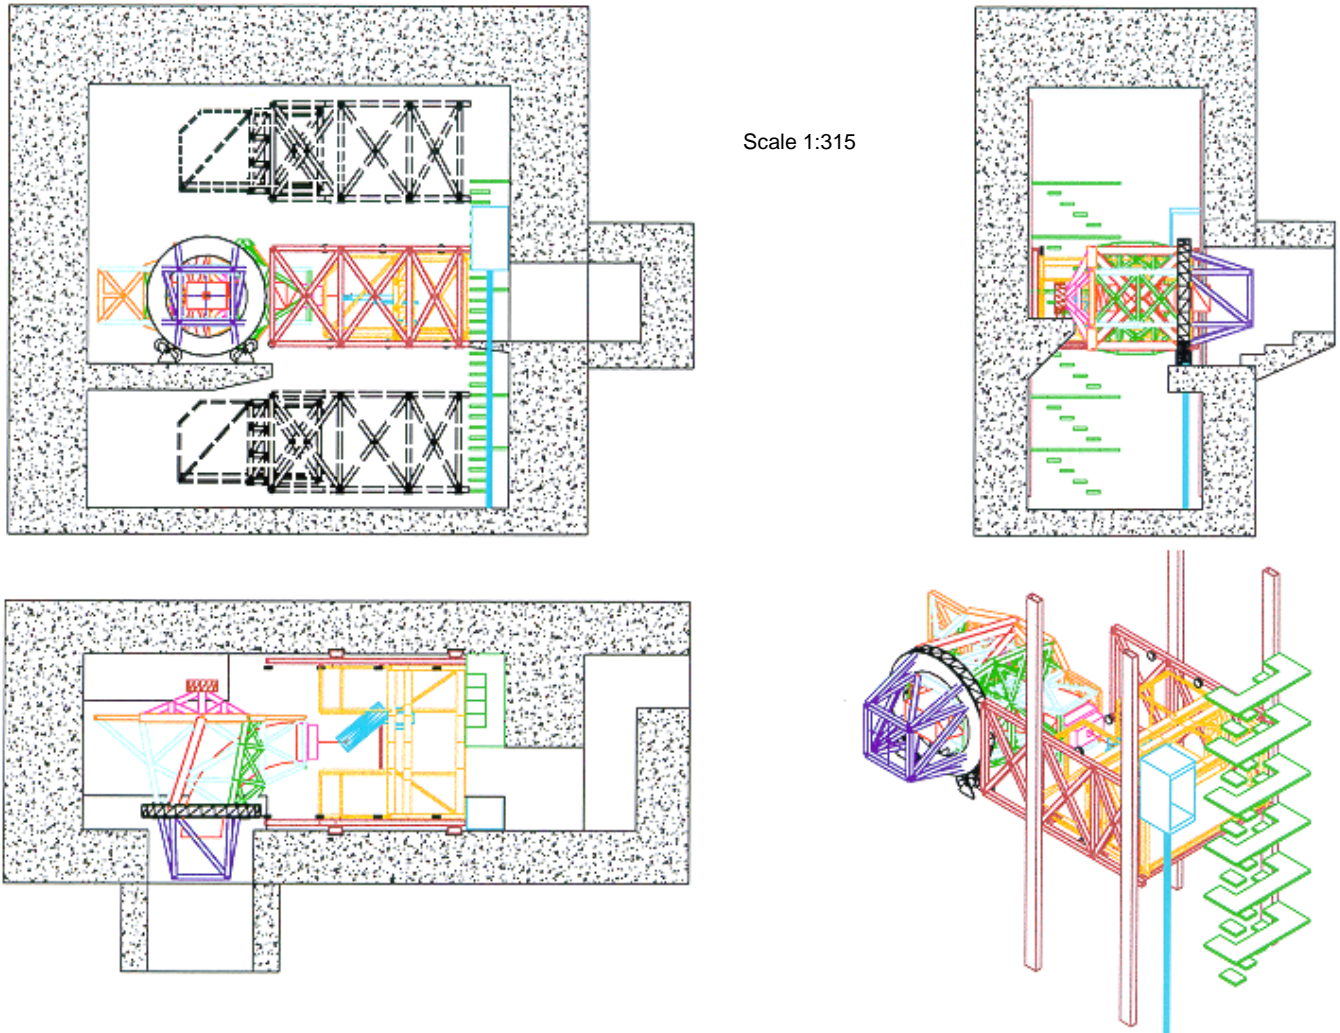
Plan, elevation, side view and perspective view of the Riesenrad Gantry with an Independent Telescopic Cabin.
